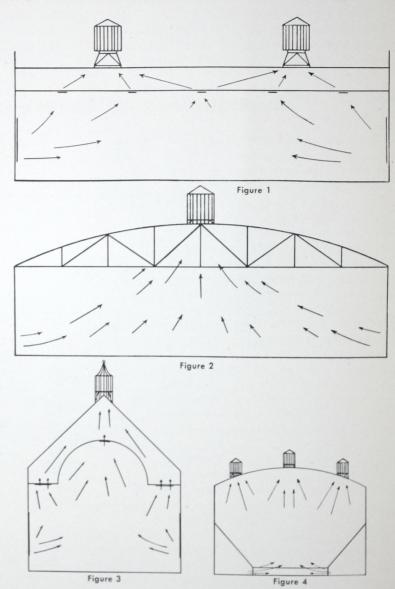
Breidert Air-X-Hausters can be installed on the roof of gymnasiums, arenas and such buildings as shown to create an upward air movement through all parts of the room. Where heavy smoke prevails as in an arena, it is essential to provide sufficient ventilators to carry off the smoke rapidly. With ventilators installed on the highest point of the roof, and fresh air admitted near the floor line, a circulation as indicated with arrows will quickly carry the smoke and foul air above the occupied zone.
